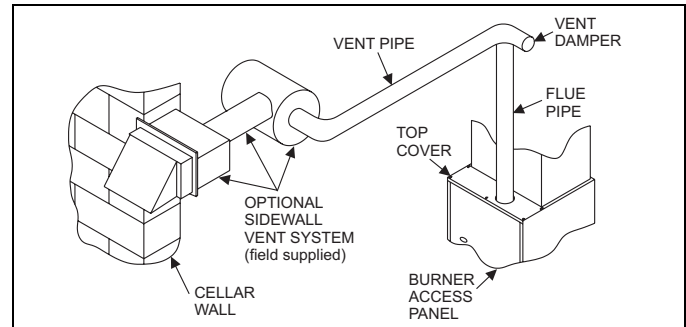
Typical Sidewall Vent and Termination Configuration
